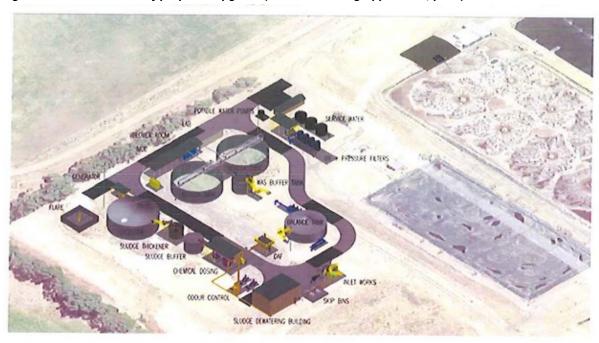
Site Plan (The plans state Commercial in Confidence. The applicant has advised that it is acceptable for the plans to be made public)
